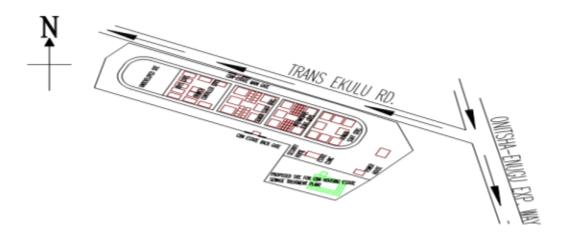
The Plan Layout of CBN Housing Estate Trans Ekulu, Enugu Nigeria
